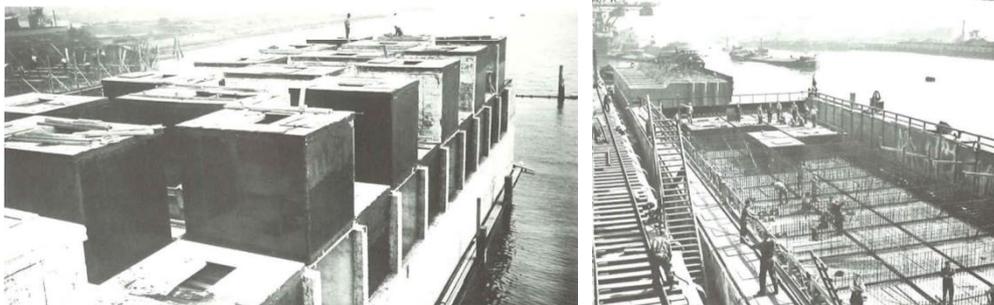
Construction of caissons by the Maas formwork system (The Netherlands, Waalhaven, left photo: 1920-1921, right photo: after 1945)
